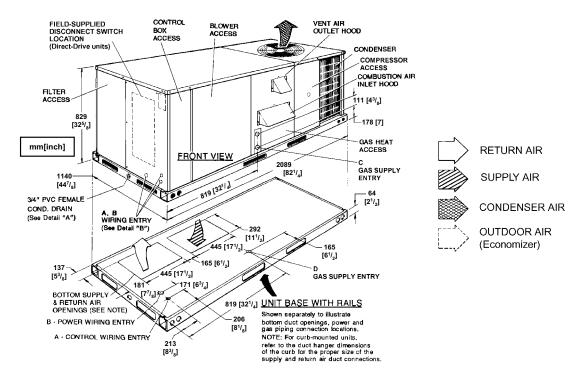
Unit Dimensions (3 - 6.3 Ton Cooling Only/Electric Heat) Front View
